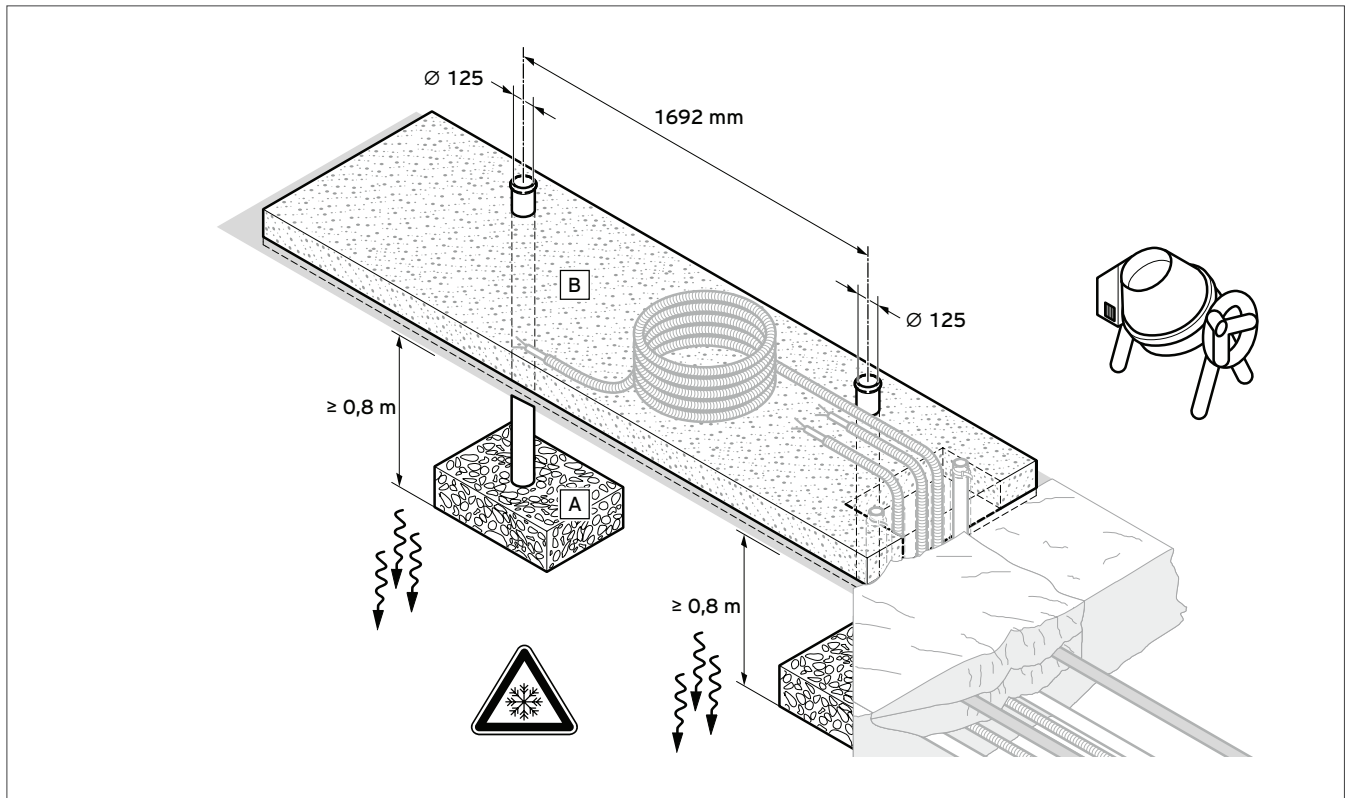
Foundation plan for two aroCOLLECT outdoor units
